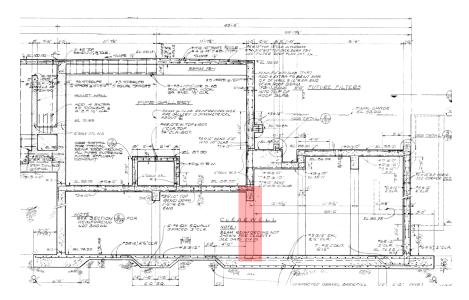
Shear Wall not Continuous to Foundation (Source Drawings: "Water Treatment Plant (A700004)")
